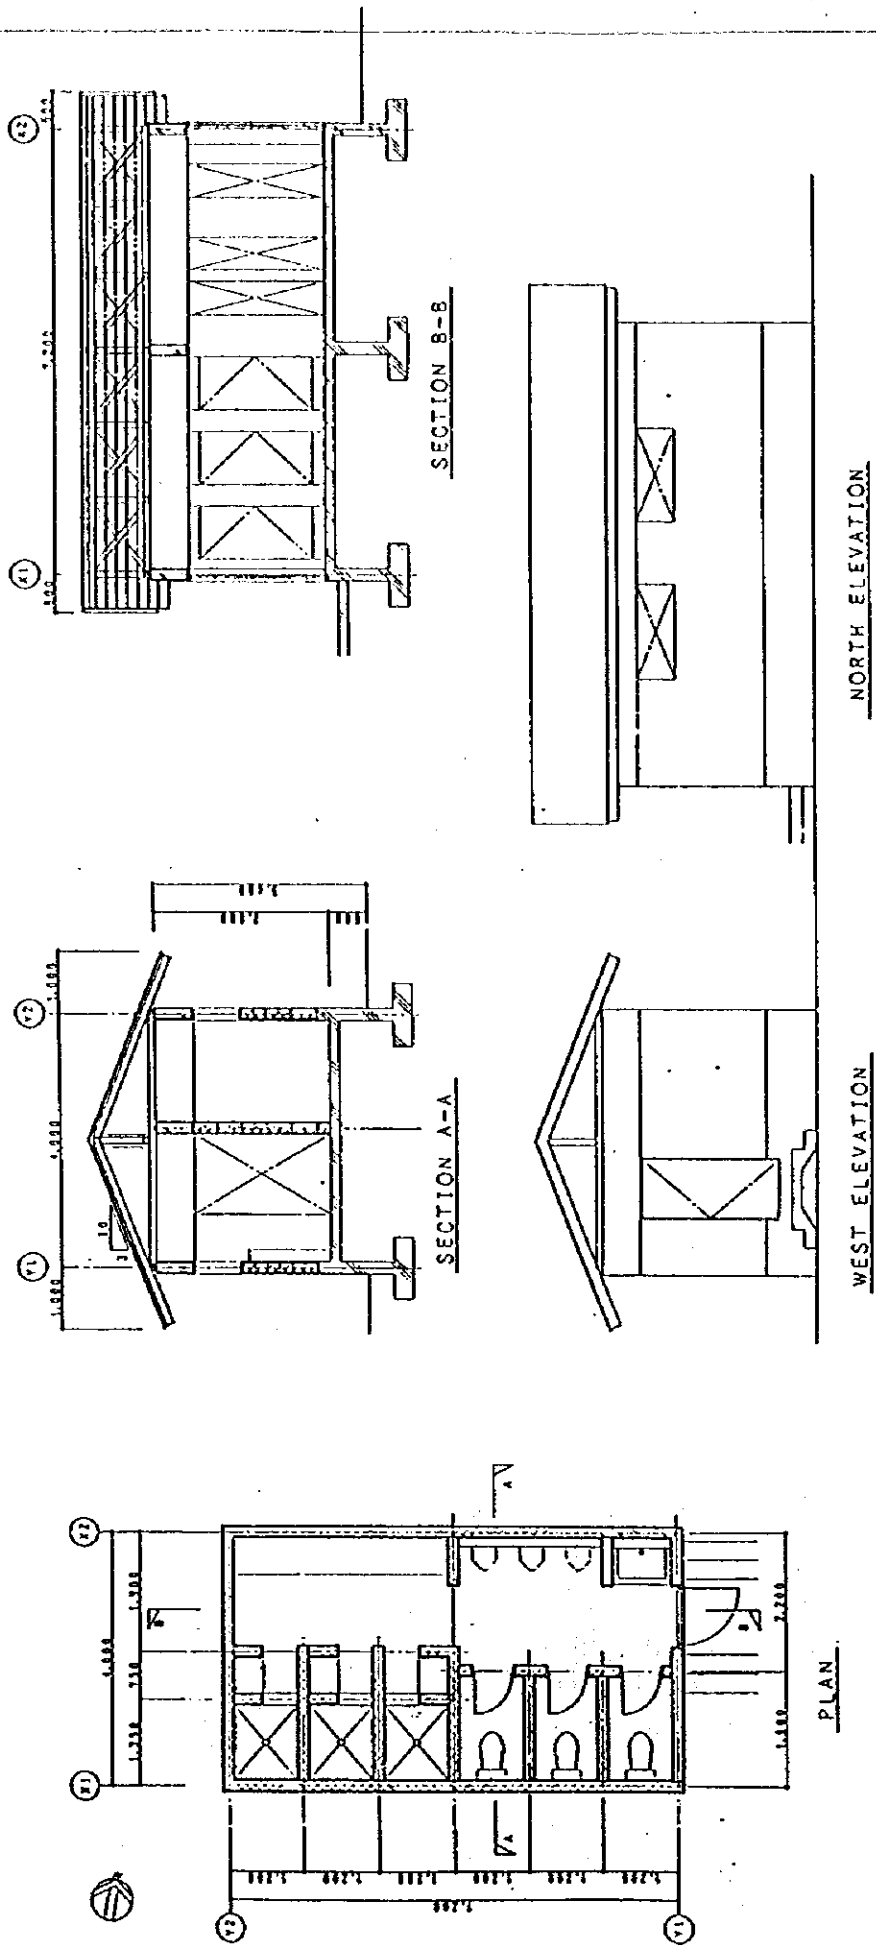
ELEVATION & SECTION FOR MAIN BUILDING
